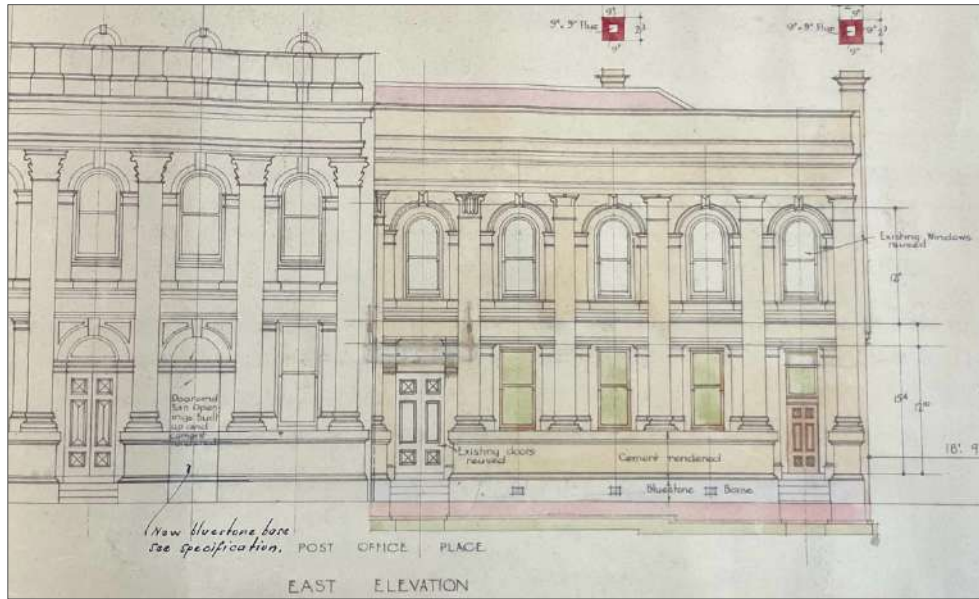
The east elevation of the new Council rates department, designed c1936 by Oakley & Parkes to match the existing town hall façade. Source: Public Records Office Victoria.
